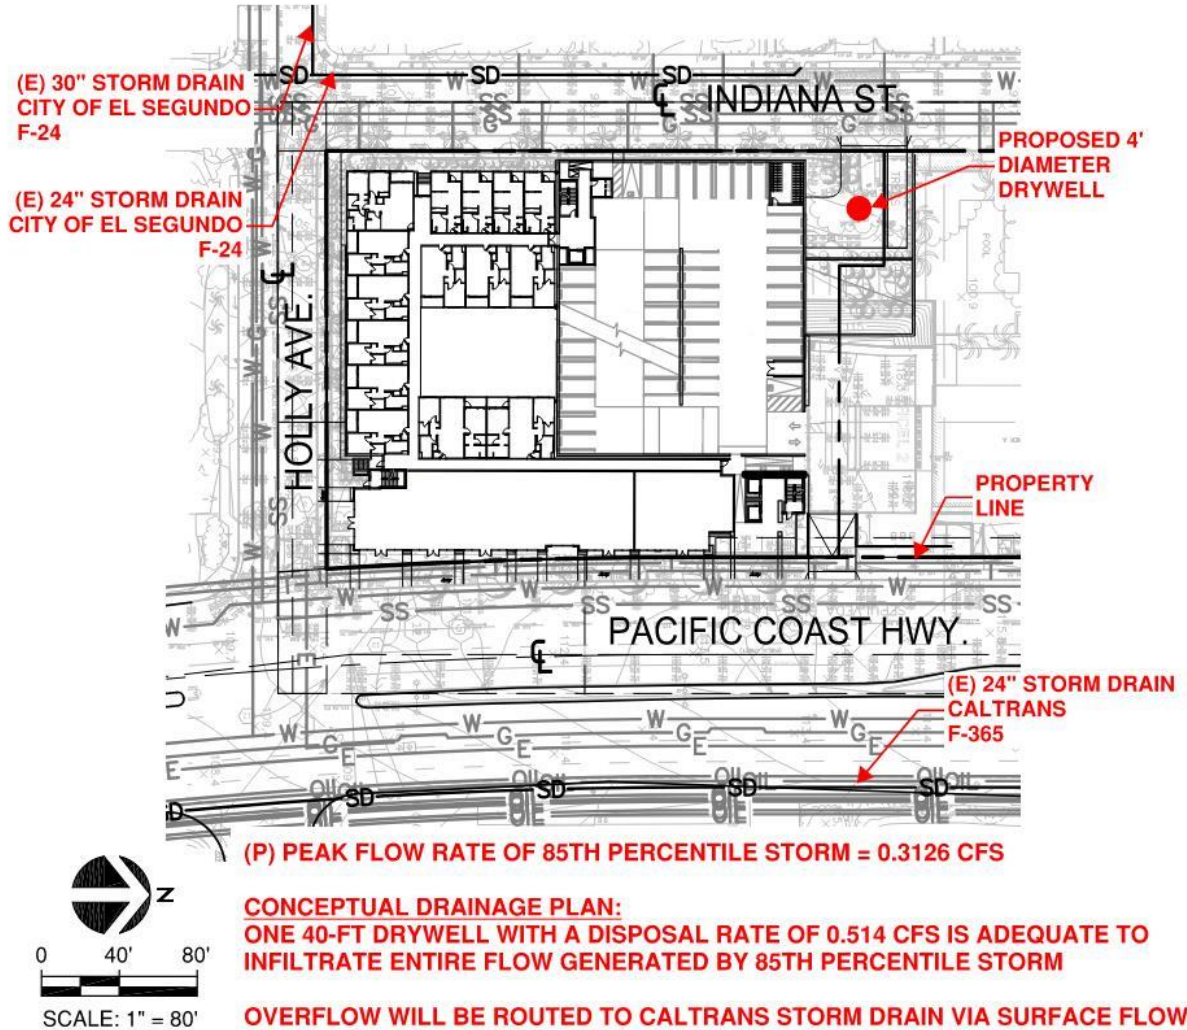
B CONCEPTUAL DRAINAGE PLAN SOUTH SITE IN THE PCC MU-1 DISTRICT
